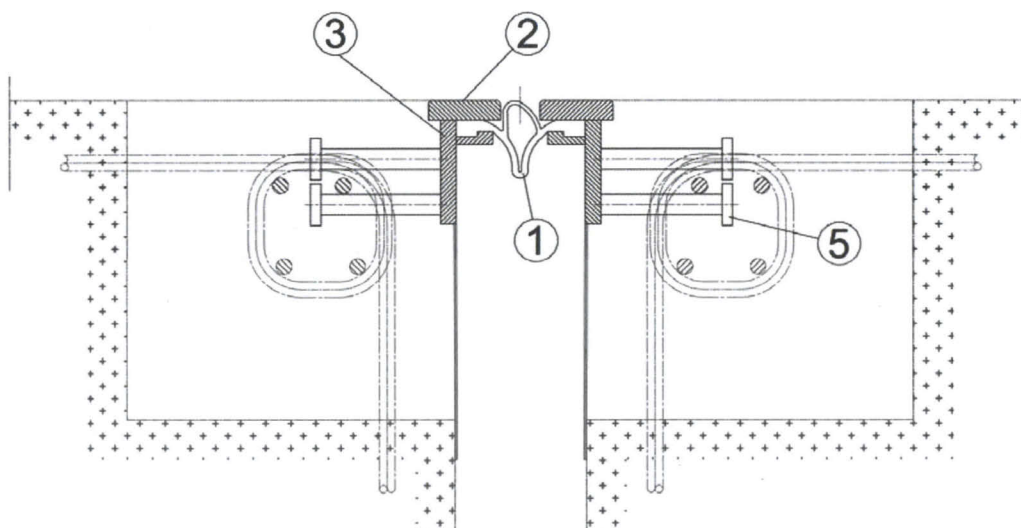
Exemplary cross section of the nosing expansion joint mageba Tensa®Grip Typ RS with seal type Hump-Seal, including anchorage consisting of stud bolts
